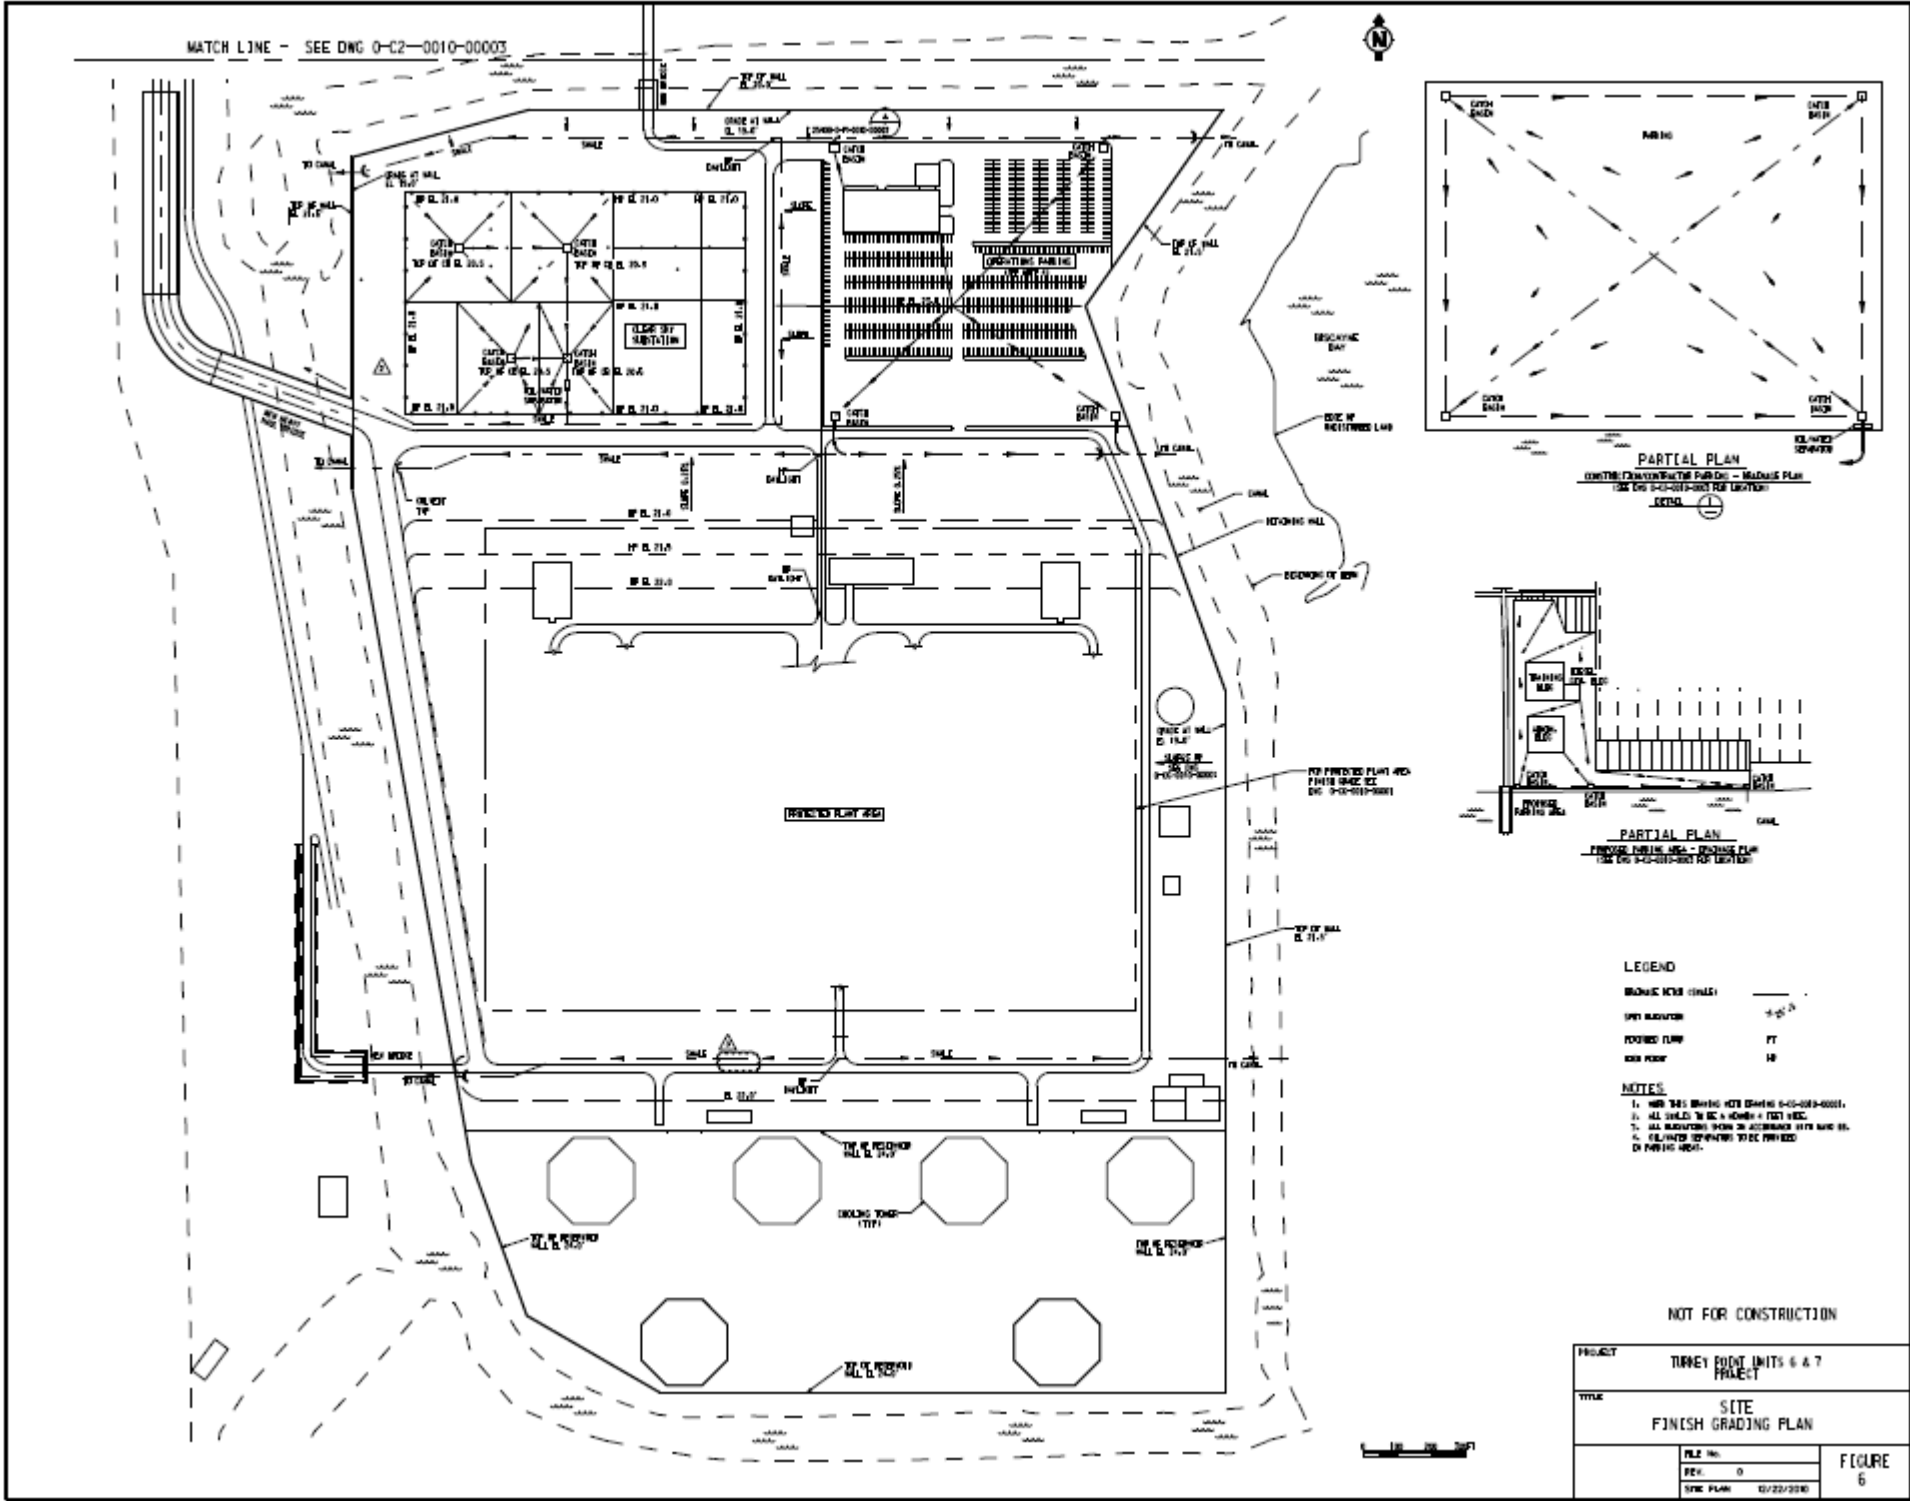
Turkey Point Unit 6 & 7 Site Finish Grading Plan
